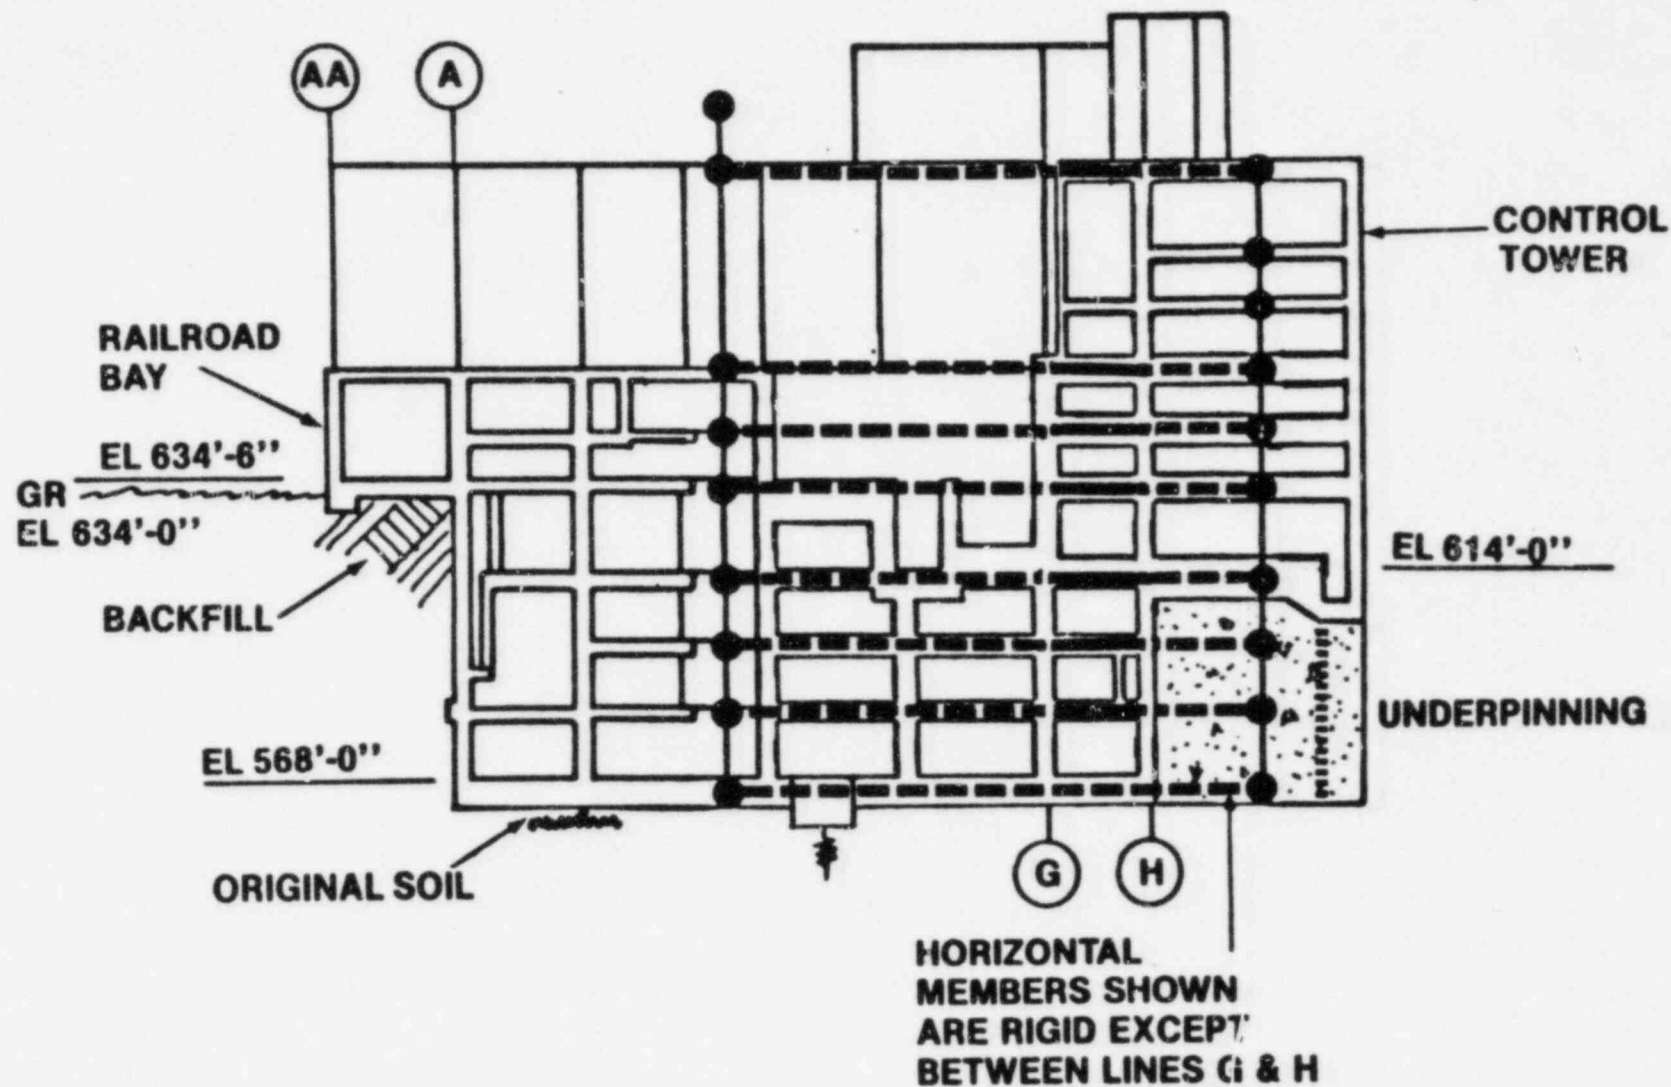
SECTIONAL VIEW OF AUXILIARY BUILDING SHOWING CONNECTIVITY BETWEEN VERTICAL BEAMS OF DYNAMIC MODEL
